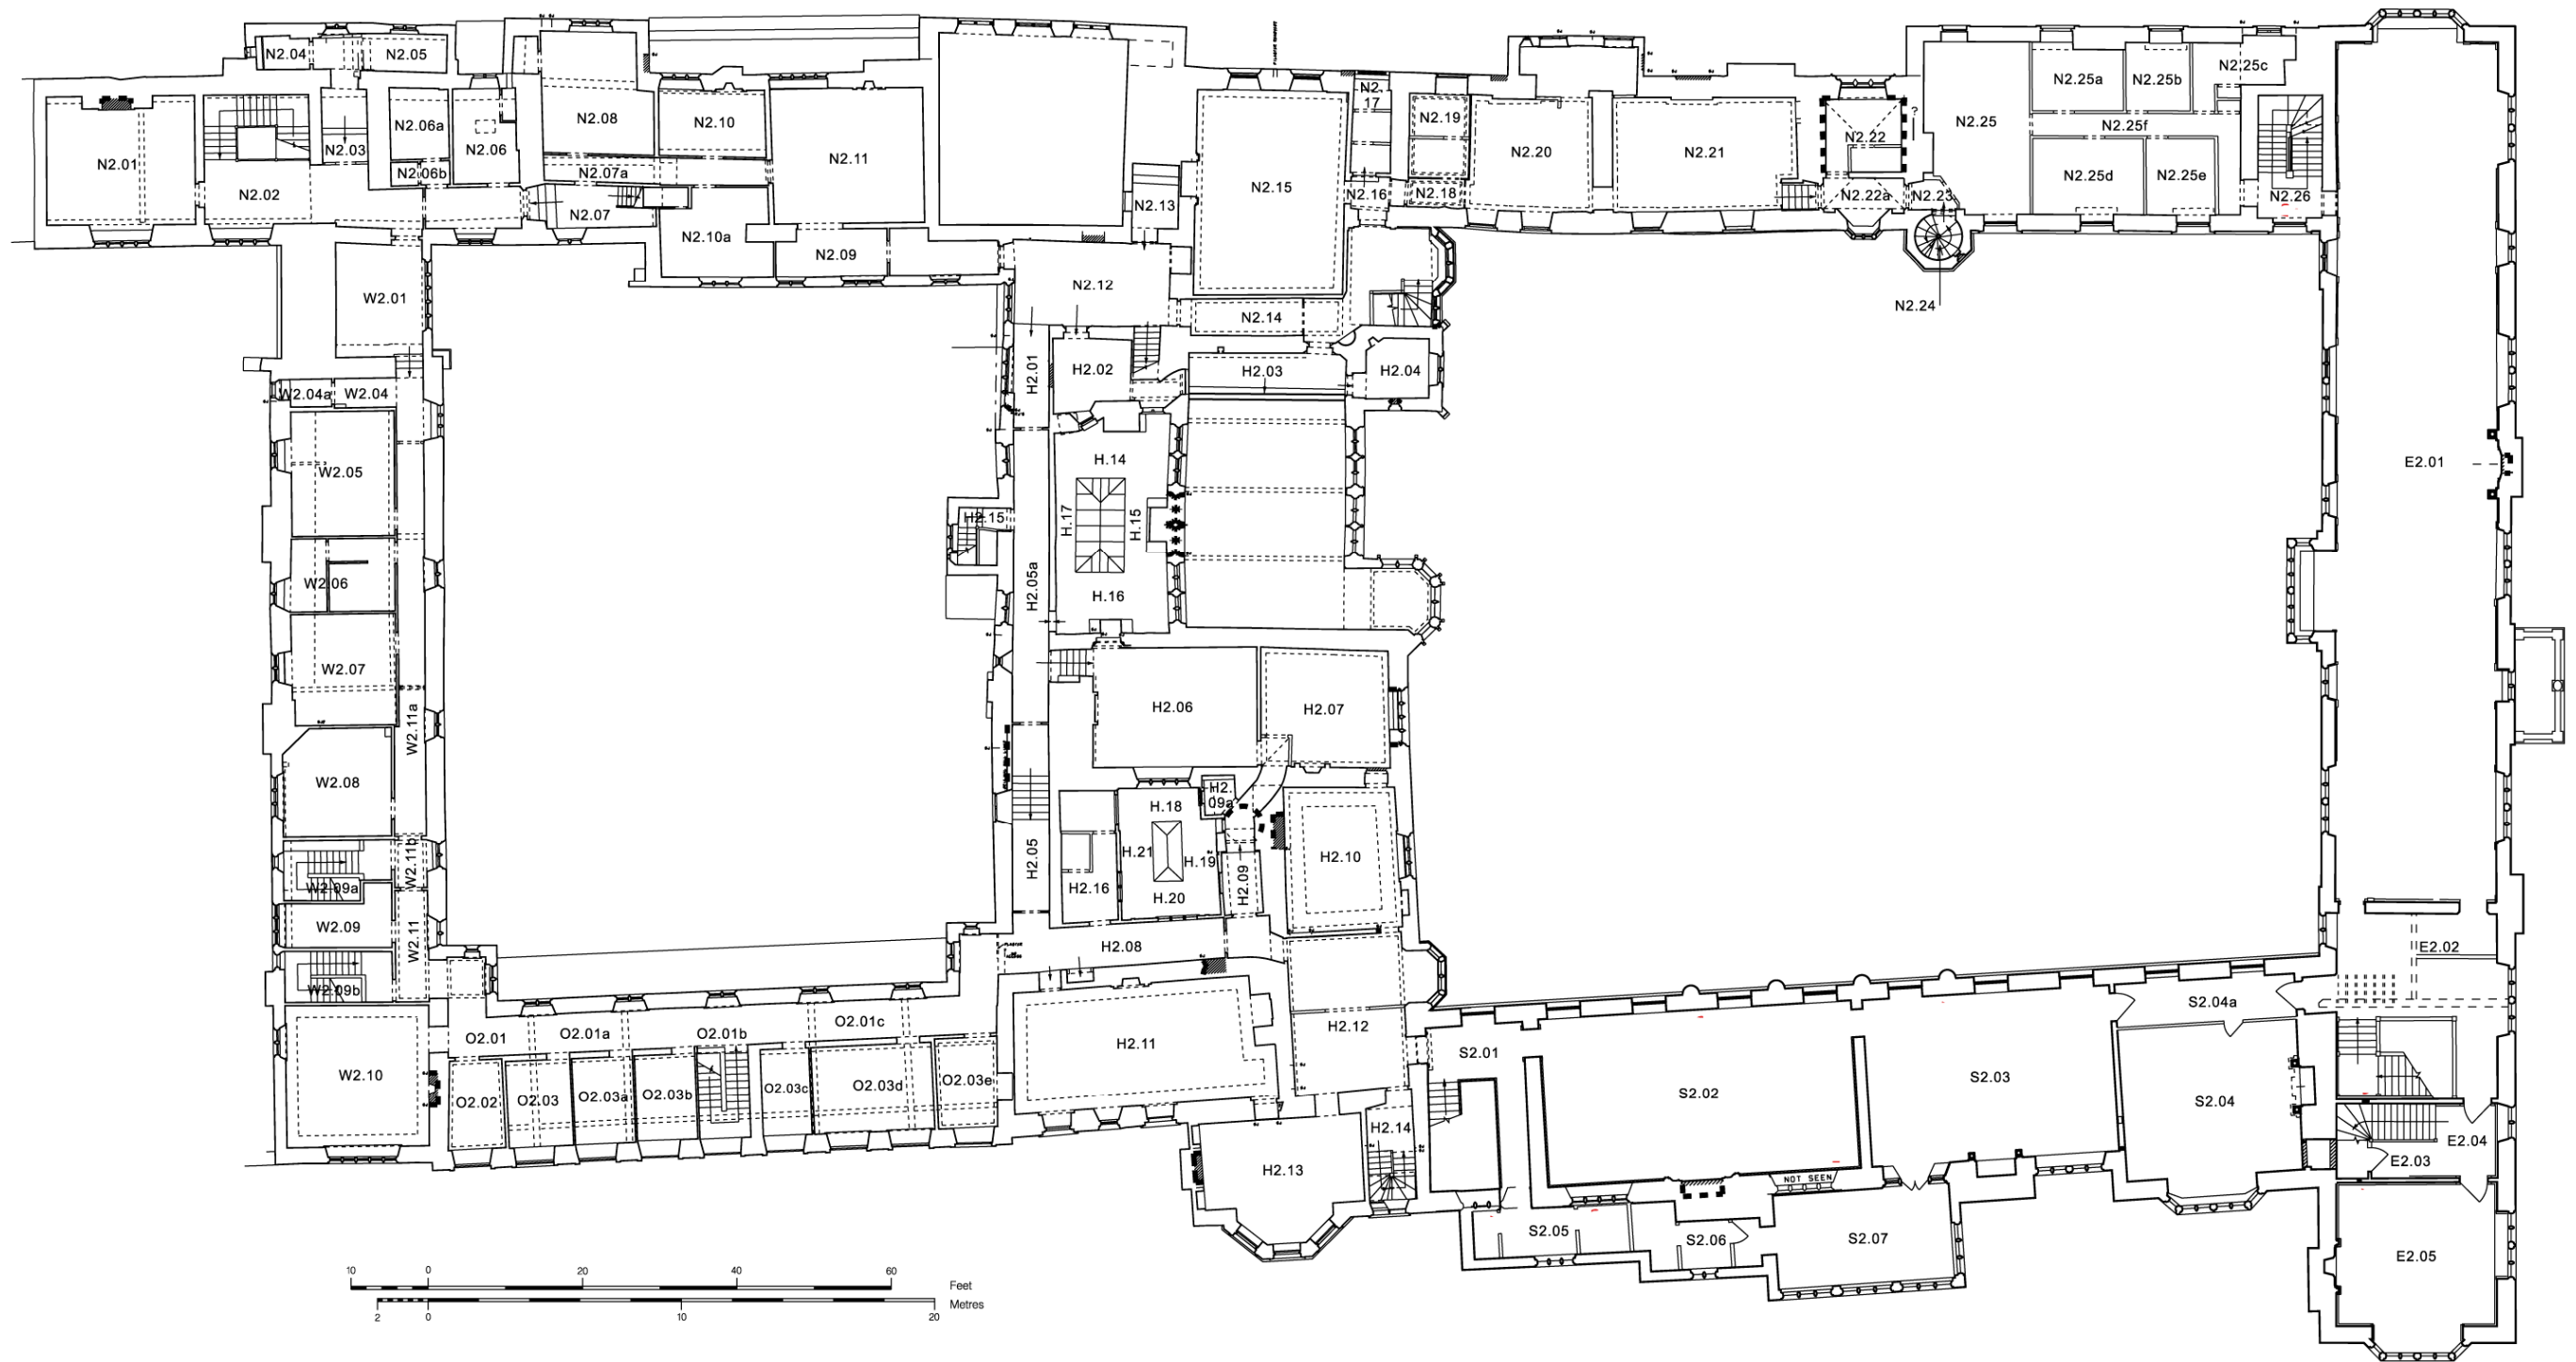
First floor of Apethorpe Hall, showing room numbers. E - east range; H - hall range; N - north range; O - Orangeries; S - south range; W - west range
